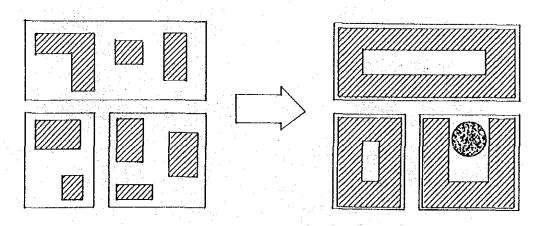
CHANGE OF BUILDING LAYOUT IN ACTIVITY CENTER
